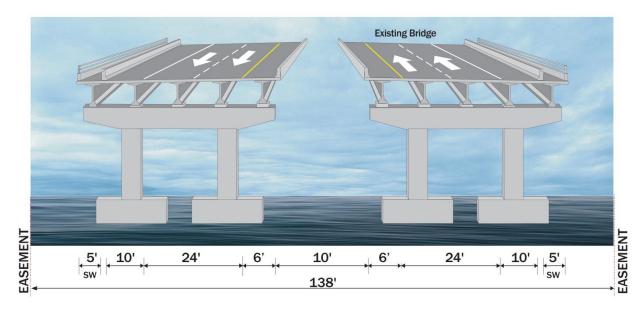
RYE ROAD ALTERNATIVE TYPICAL SECTIONS
